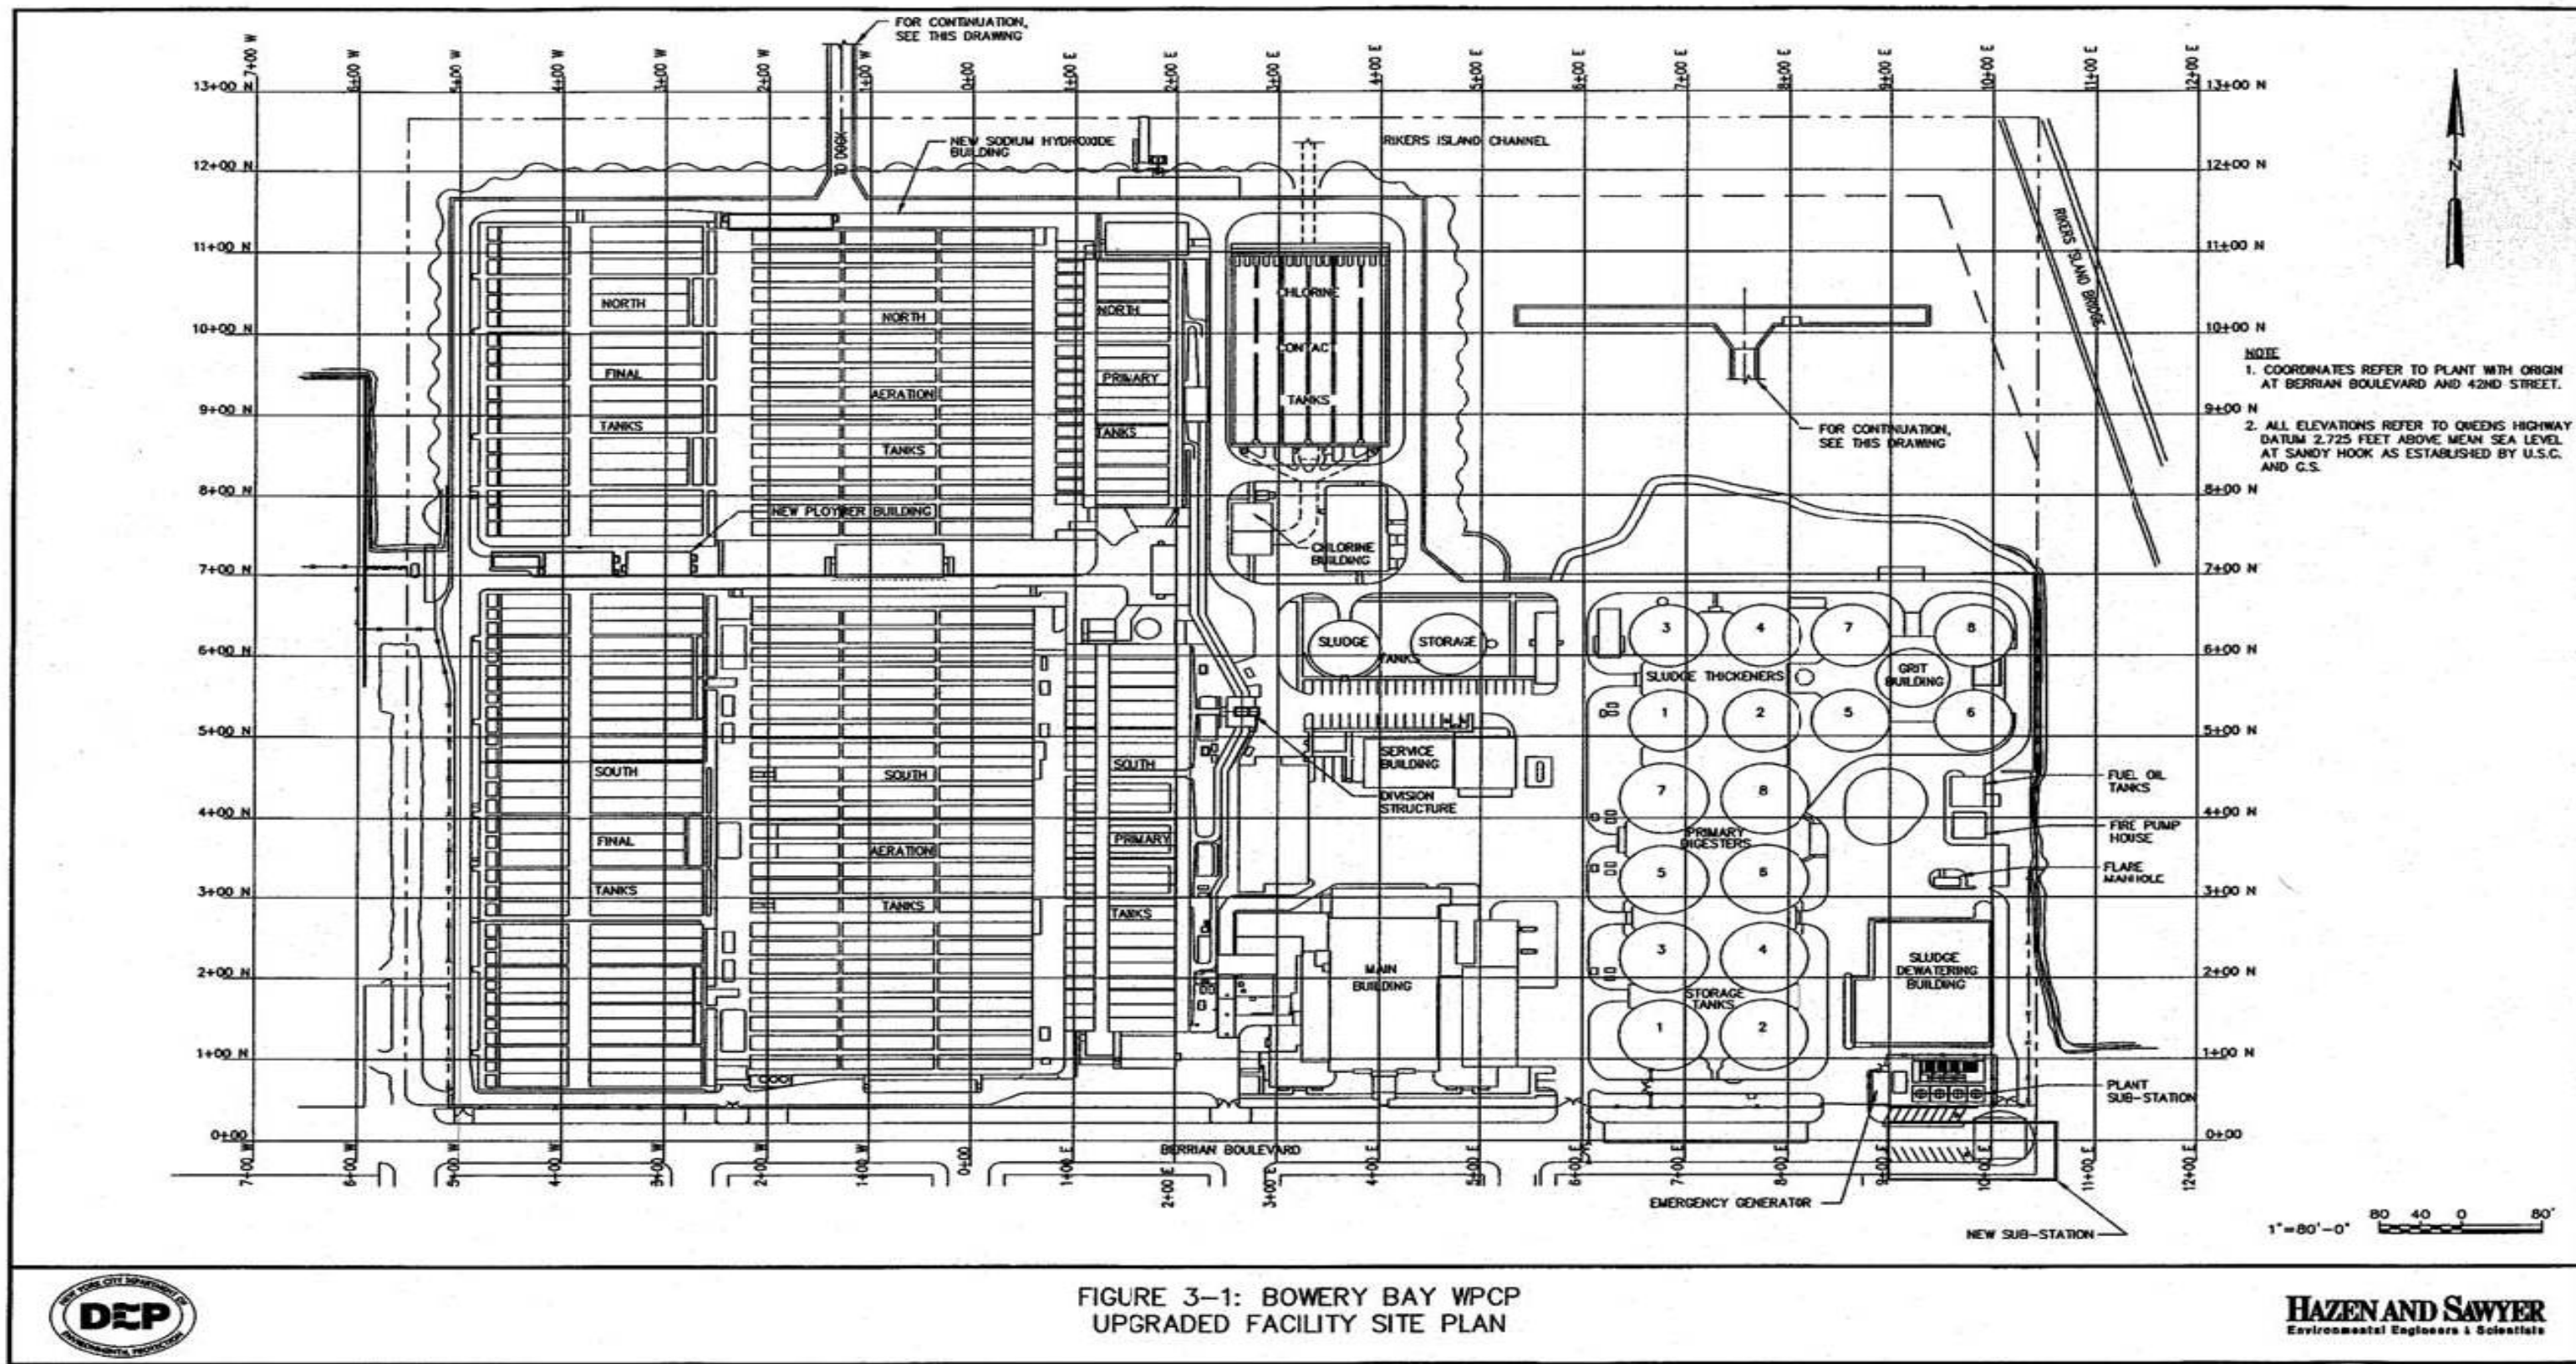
BOWERY BAY WPCP UPGRADED FACILITY SITE PLAN
